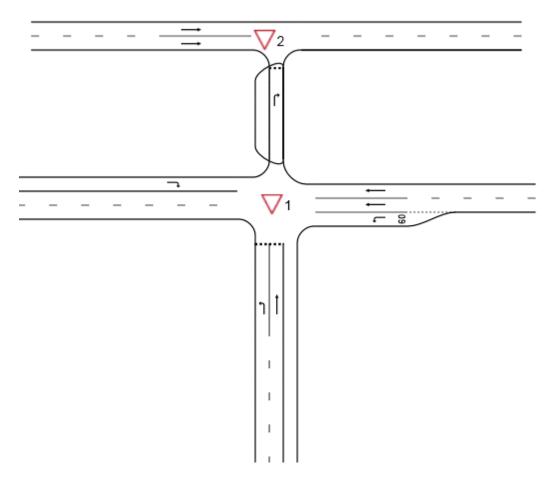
Joondalup Drive / Drovers Place T-junction existing layout analysed in SIDRA
